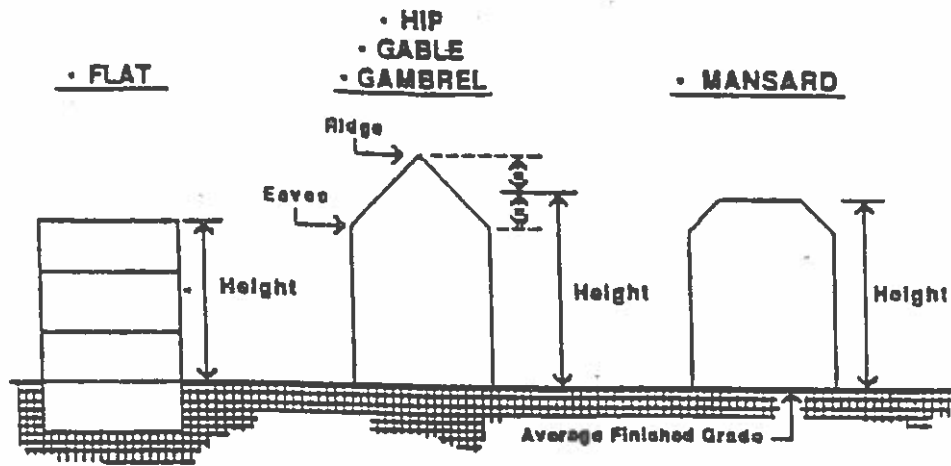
MEASUREMENT OF BUILDING HEIGHT
